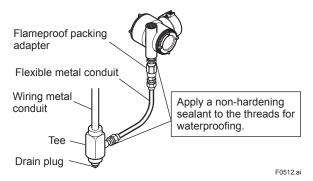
Typical Cable Wiring Using Flameproof Packing Adapter
